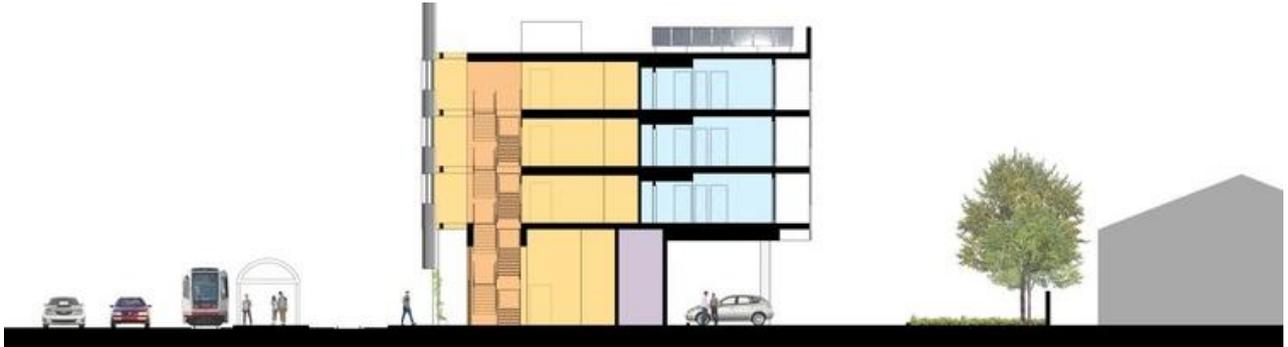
indicating Section and how they interacting with road edges. (Source: <http://www.archdaily.com>, Accessed 18 August 2017)
